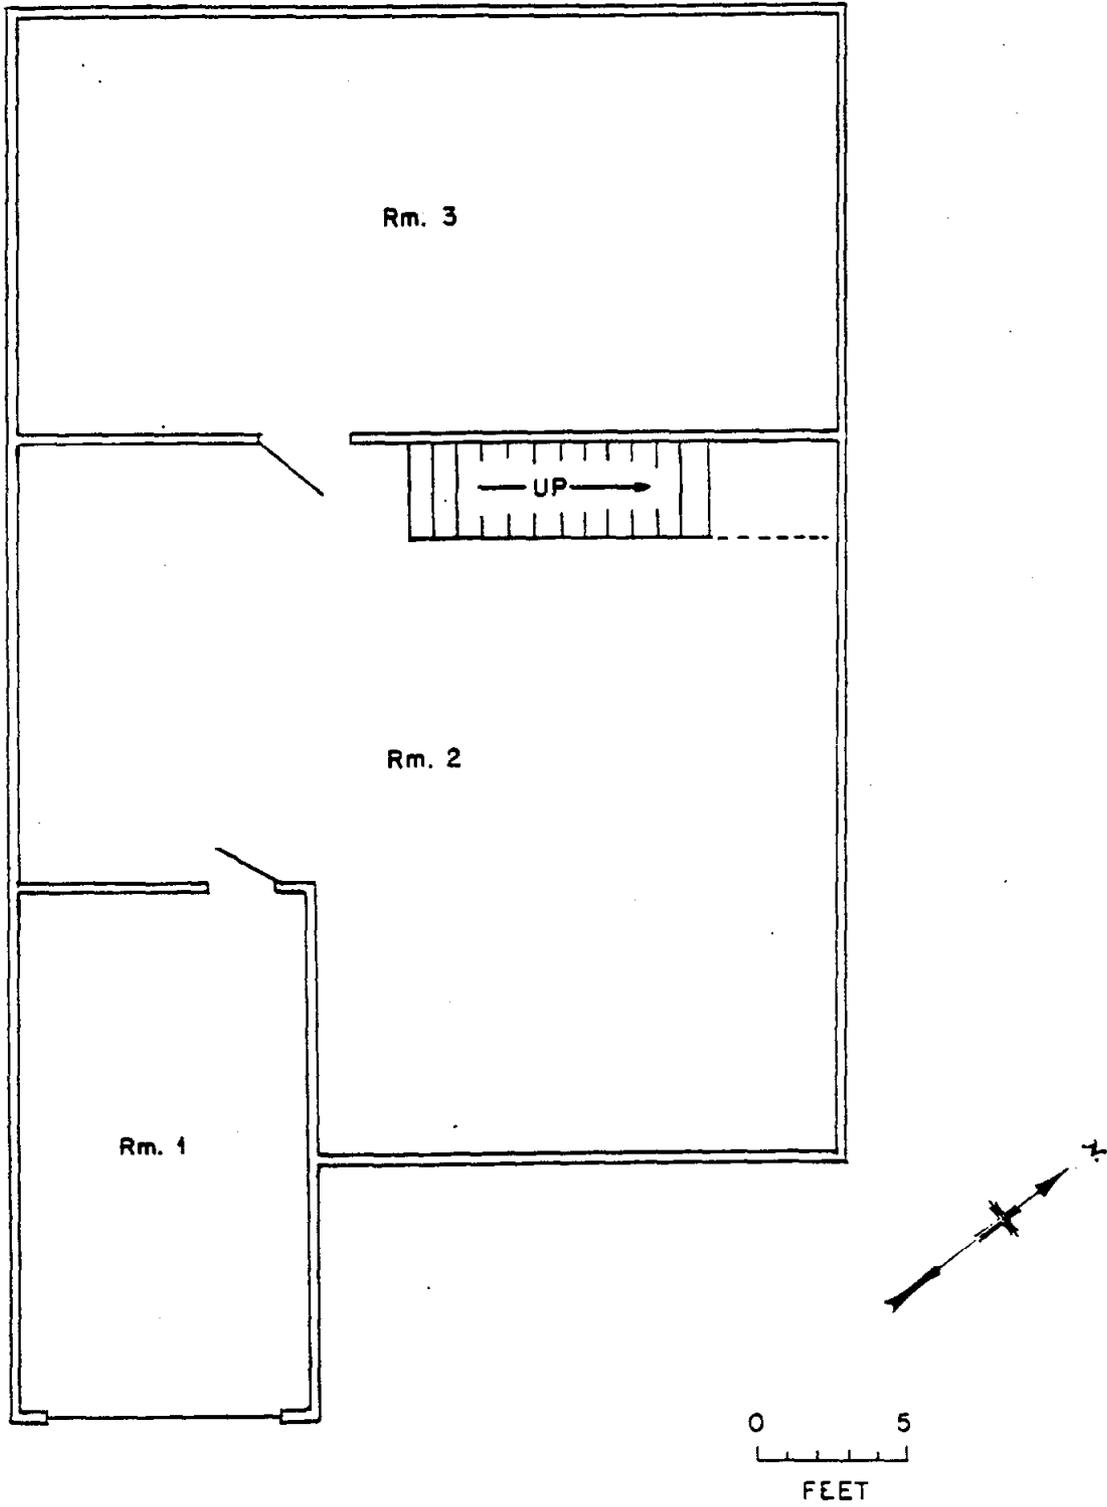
Location of rooms in basement at 475 Davison Avenue.
